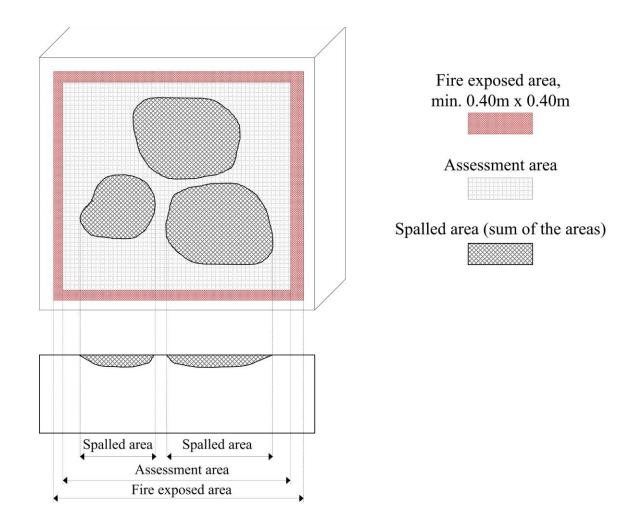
Determination of the assessment area and spalled area for non-homogenous spalling
